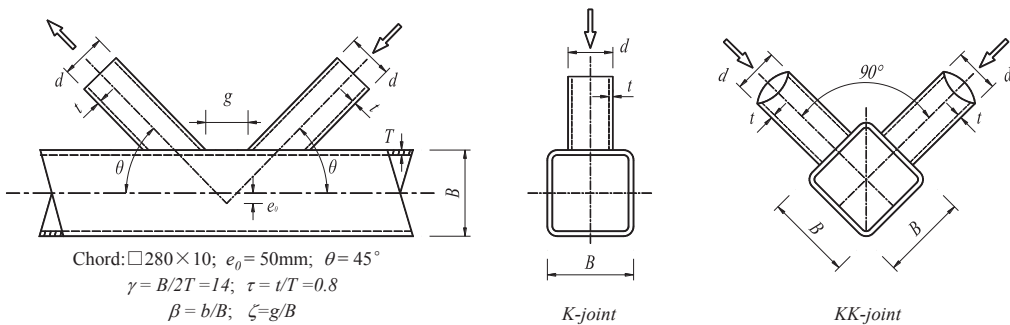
CHS-to-RHS K/KK-joint: Geometric dimensions and parameters
